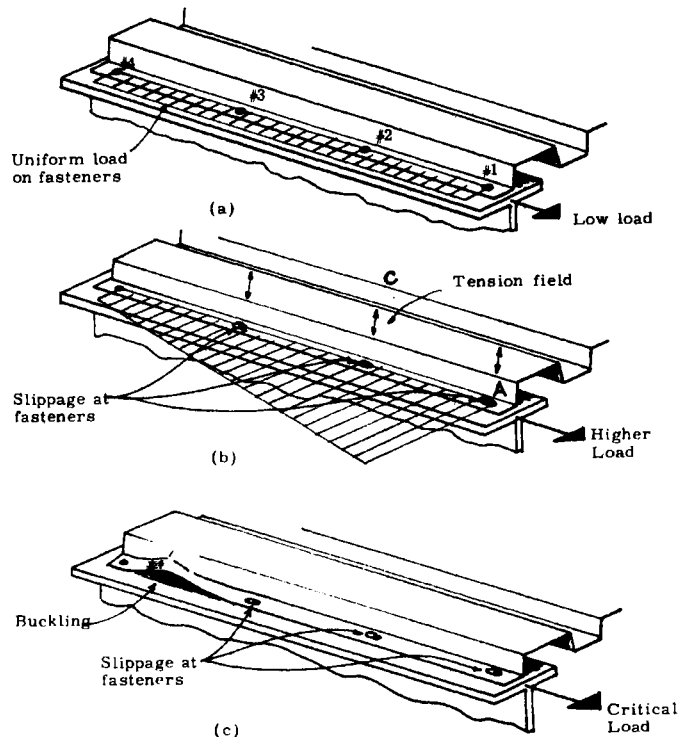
Load Transfer on Edge Welds Prior to Buckling
